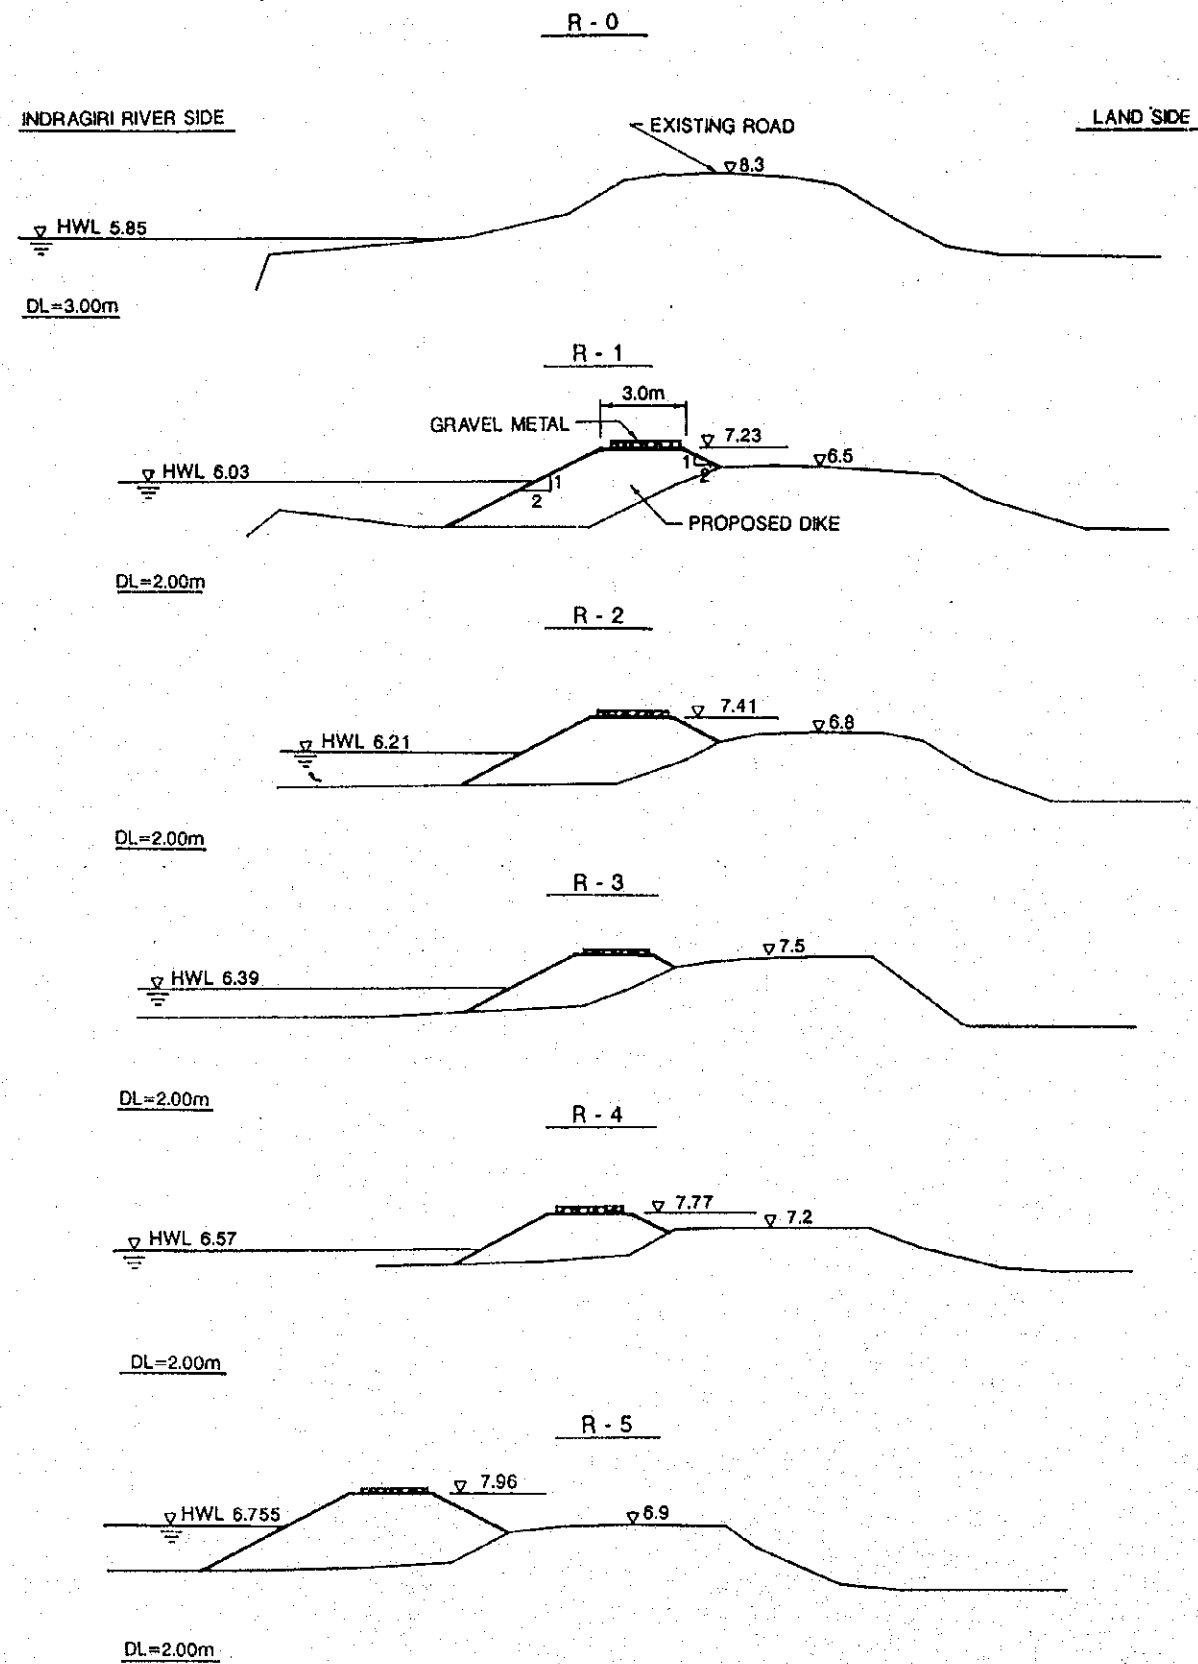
PROPOSED PLAN (INITIAL PLAN) OF FLOOD CONTROL FACILITIES FOR RENGAT AREA
